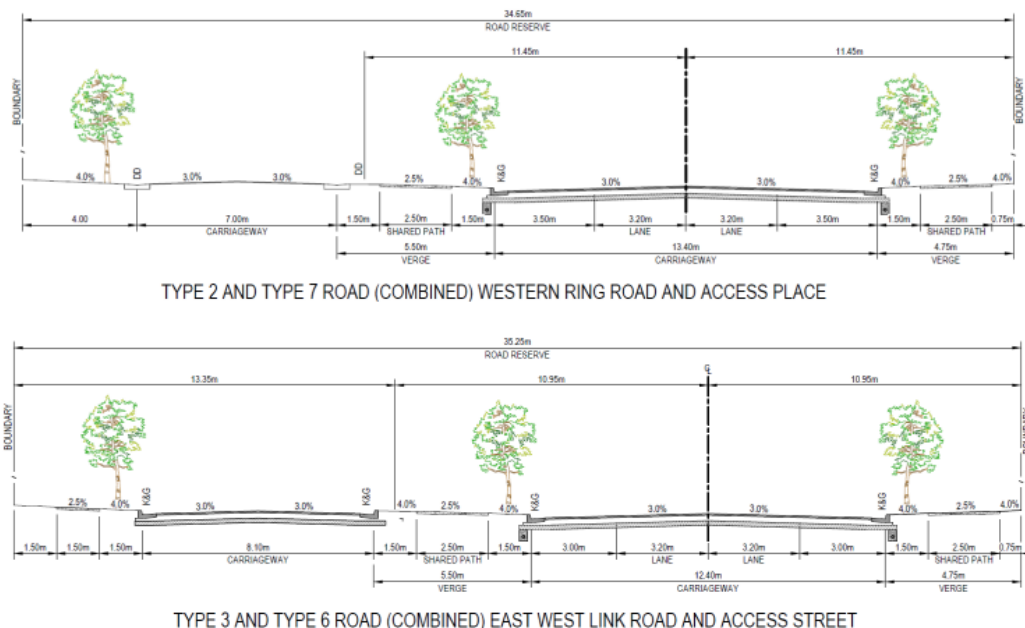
Typical Road Cross Sections for Western Ring Road and East West Link Road
